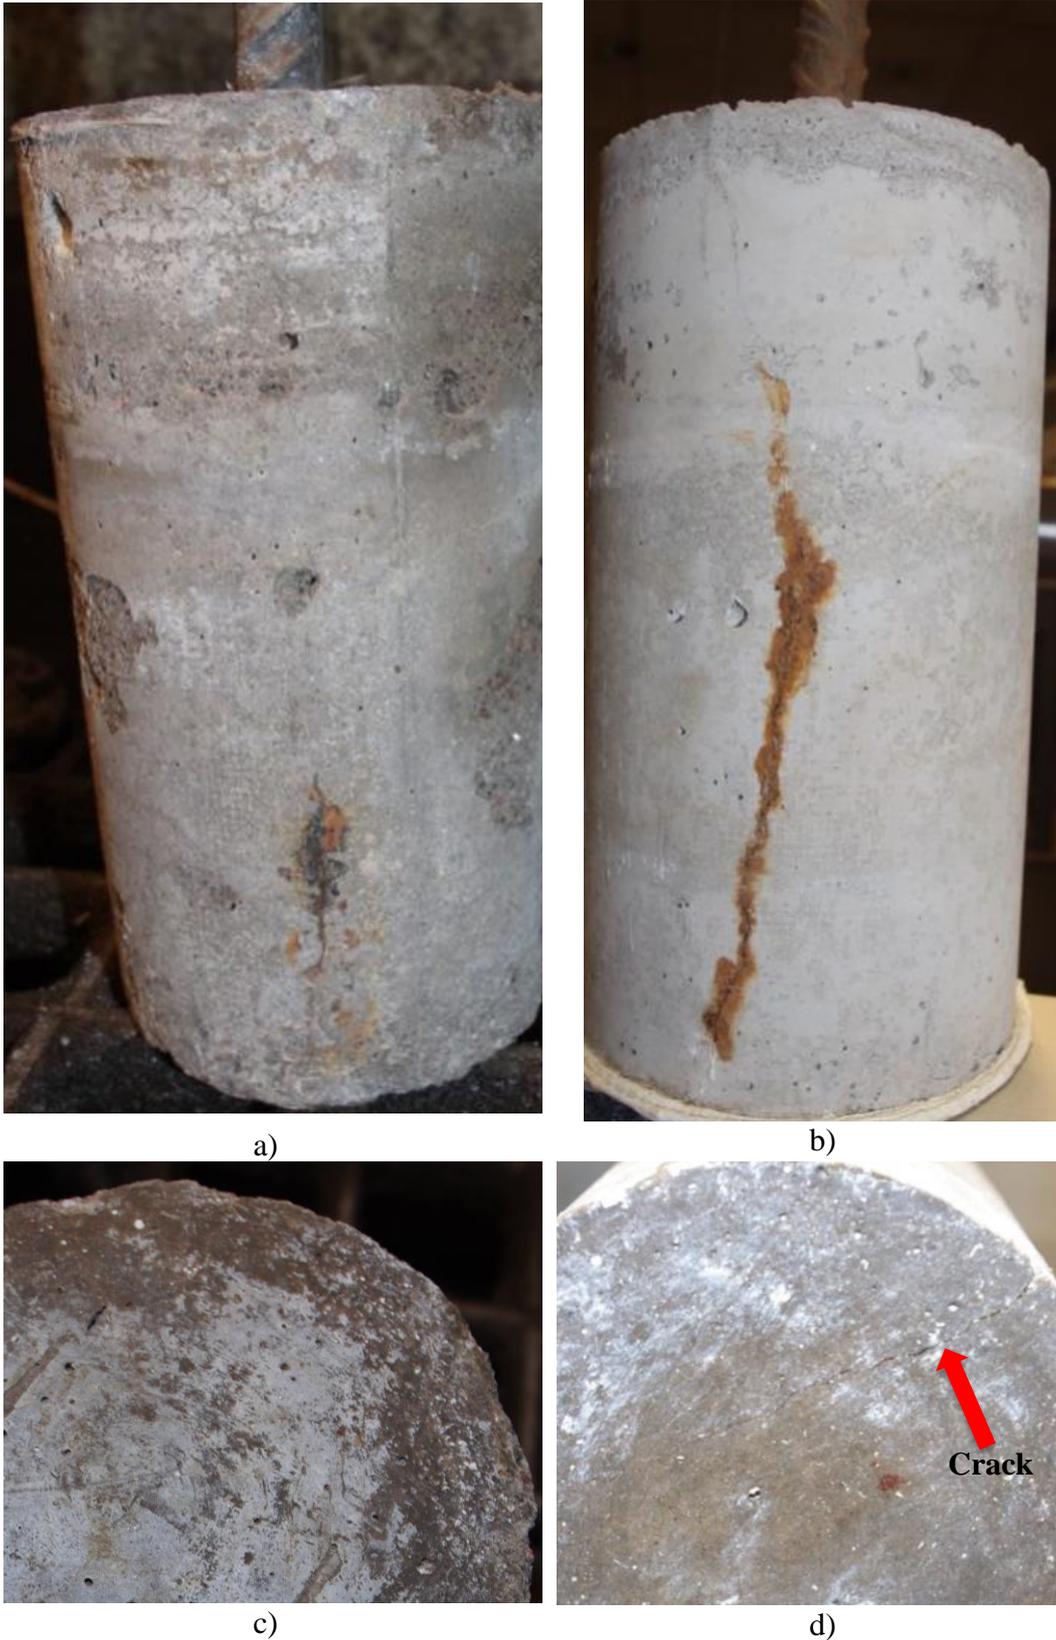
Crack propagation, a) Crack partly along the height of specimen D1, b) Crack along the full height of specimen E2, c) No crack at the bottom of specimen D1, d) Crack at the bottom of specimen E2
